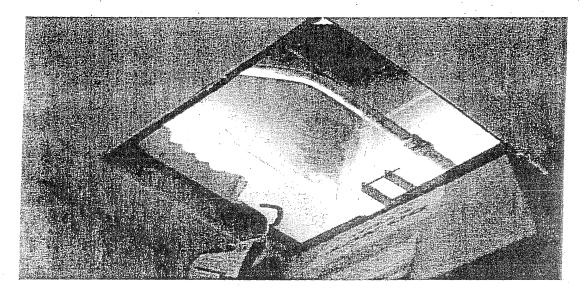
8TS6 12" by 12" Access Panel Above Ceiling.
